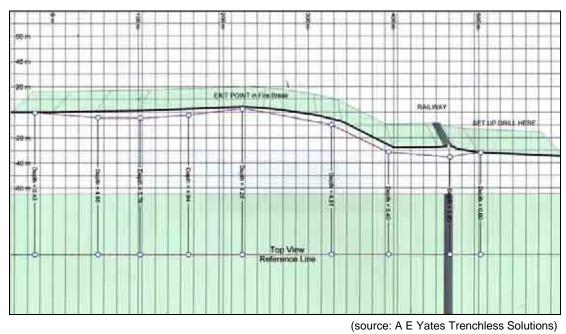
Proposed directional drill at Poppy Line Railway and Kelling Heath in crosssection
